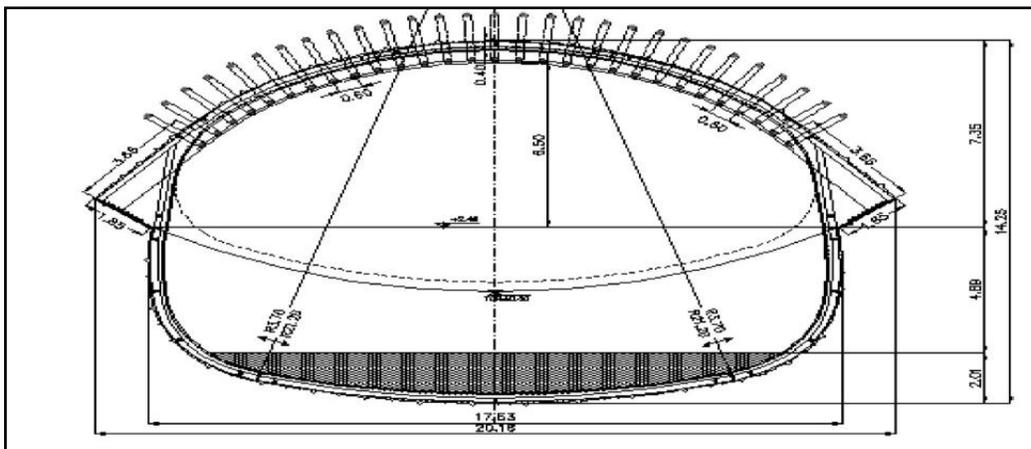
Excavation geometry of the typical cross section (maximum enlargement) [7]
